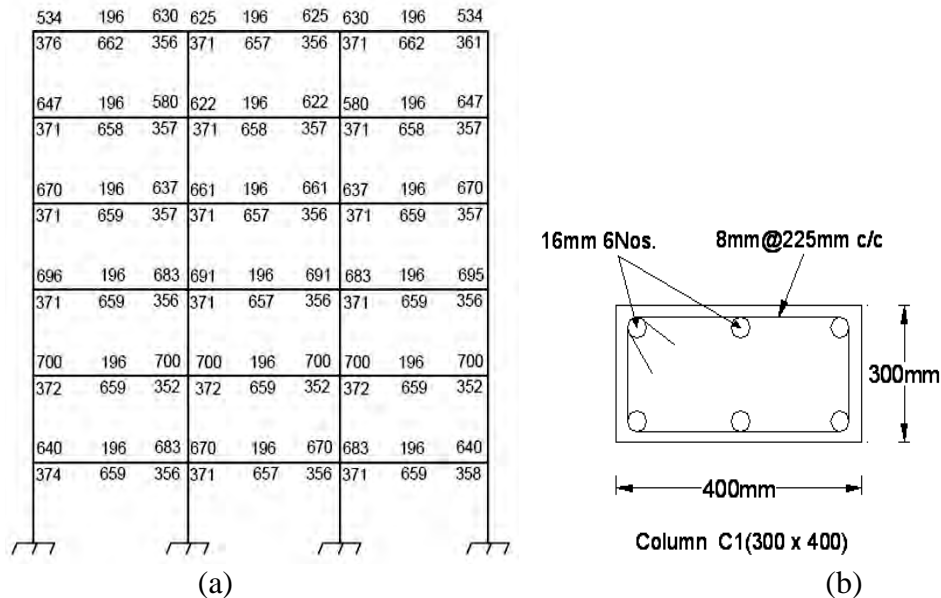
Details of 6-storey frame (a) Longitudinal reinforcement in beams (mm²)
